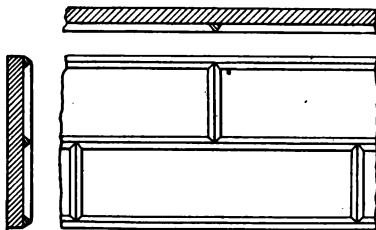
Diagram Showing Method of Giving Masonry Facing to Concrete
